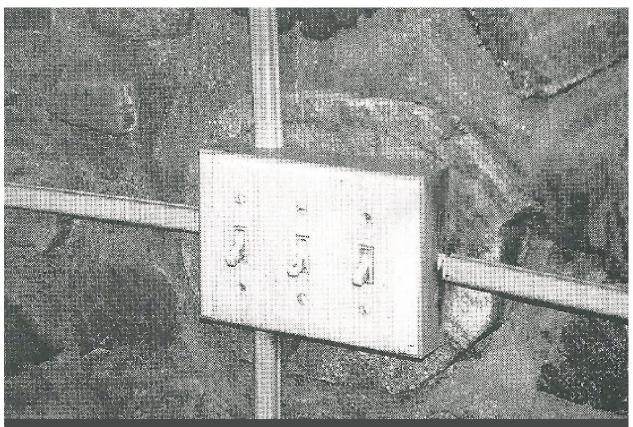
An example of how electrical wiring and applications can be mounted on the exposed inside surface of the cordwood wall. The wires are protected in adequate tubing that can be mounted to the wood; photo by: [Roy, 2016, p. 101].
